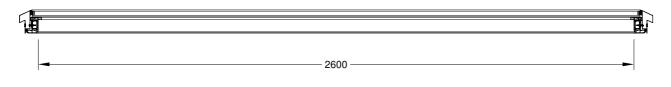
Section view of the received and tested sample (declared nominal dimensions, expressed in mm)
